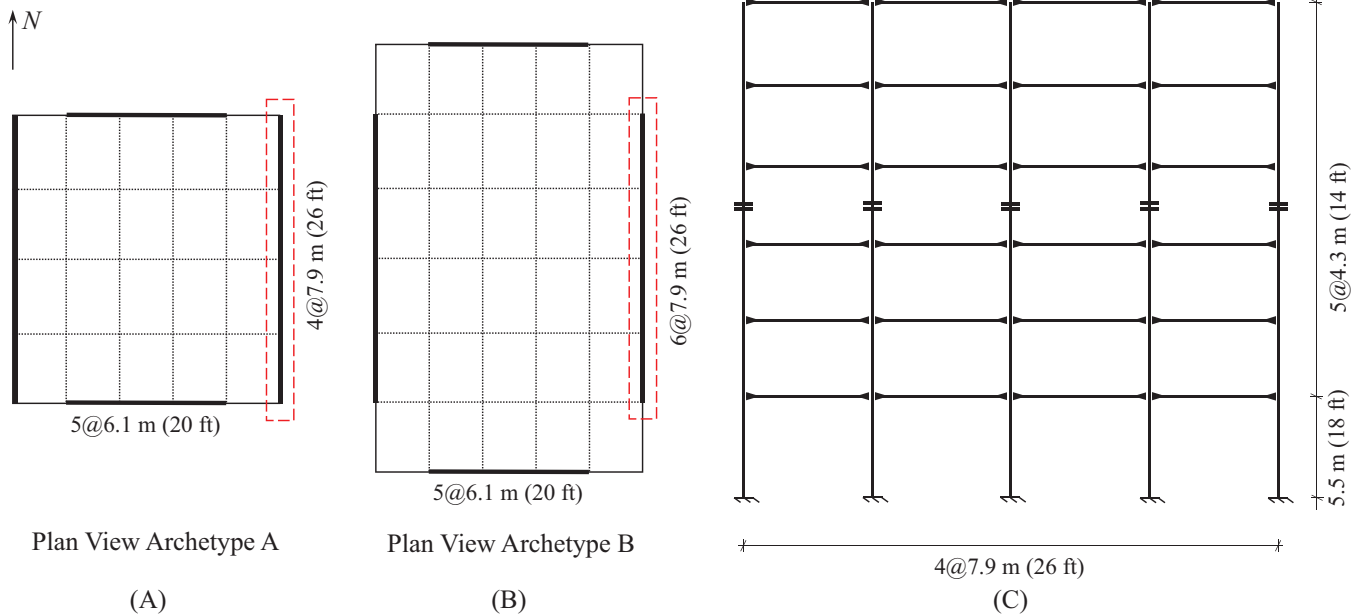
| Archetype building scheme: (A) Plan view specimen A, (B) plan view specimen B, and (C) elevation for both archetype buildings A and B.
